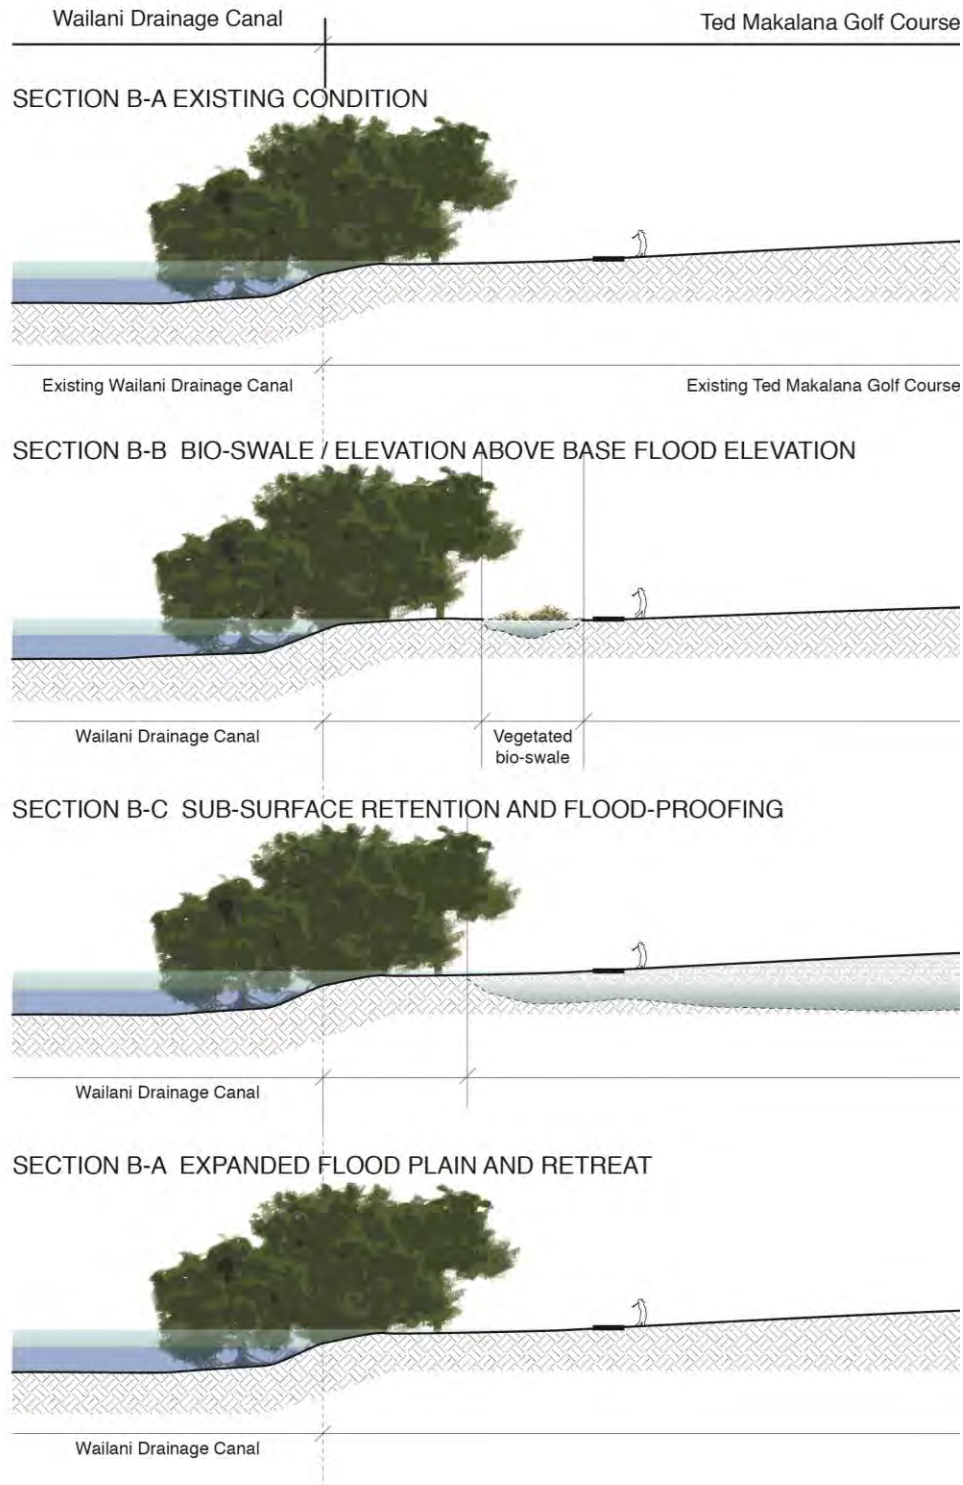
Waipahu Section Drawings B at Ted Makalana Golf Course
